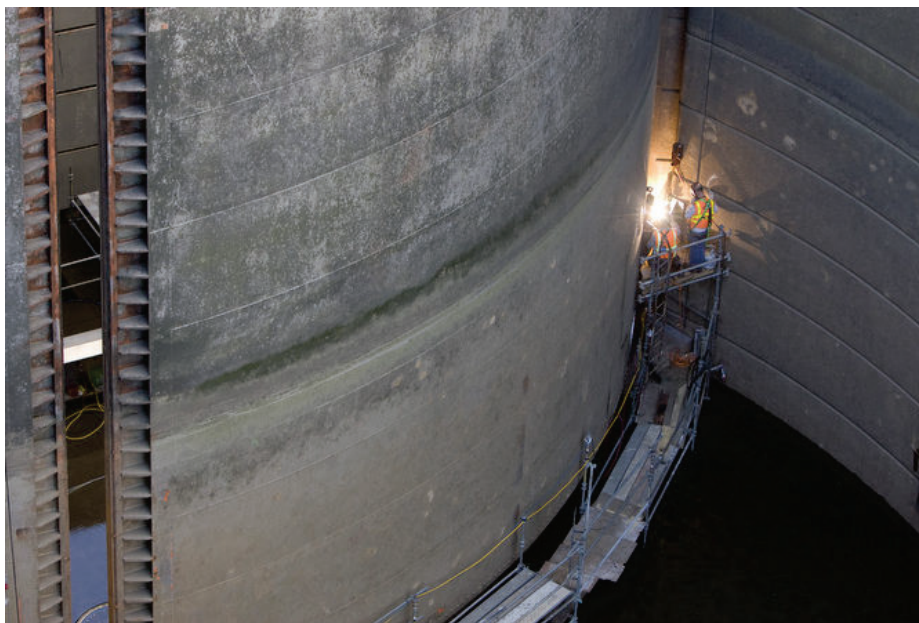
Repairs conducted on a lock gate at The Dalles Dam.
